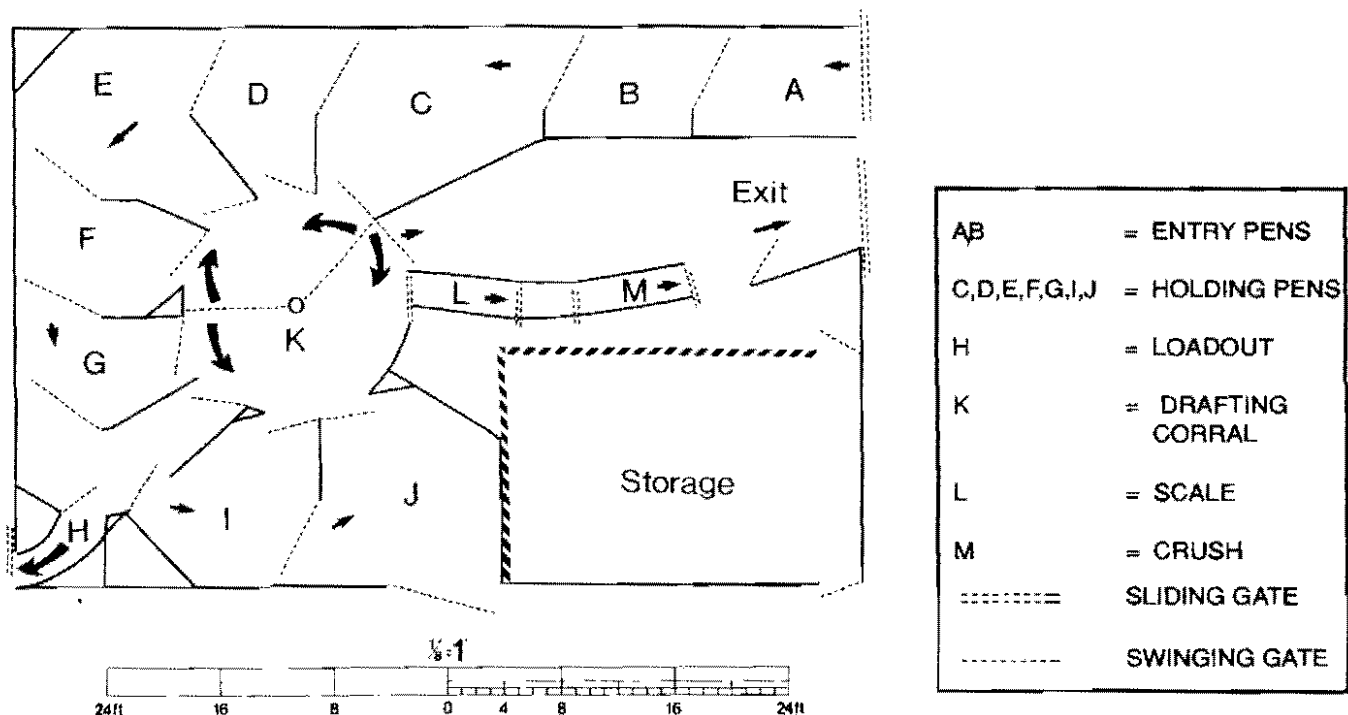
A handling facility design for reindeer or wapiti (facility constructed inside a standard straight-wall equipment shed).
